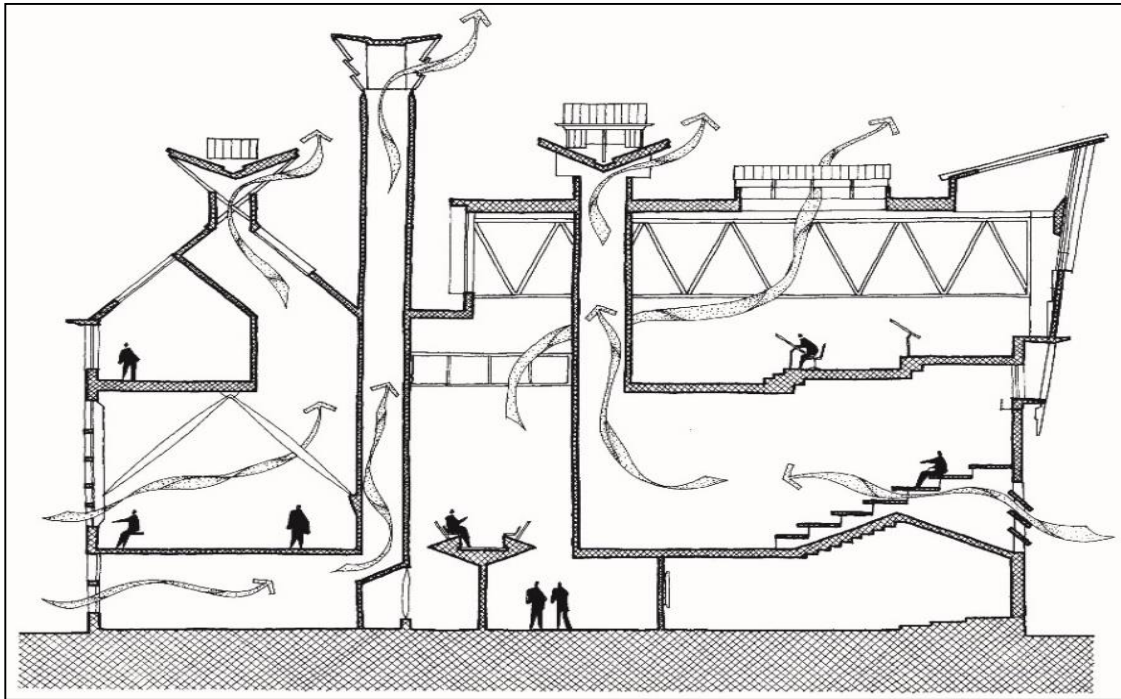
Stack Ventilation in Buildings (Section: The Qucen’s Building, Dc Monfort University-Leicester England) (Mashhadi, 2012)
